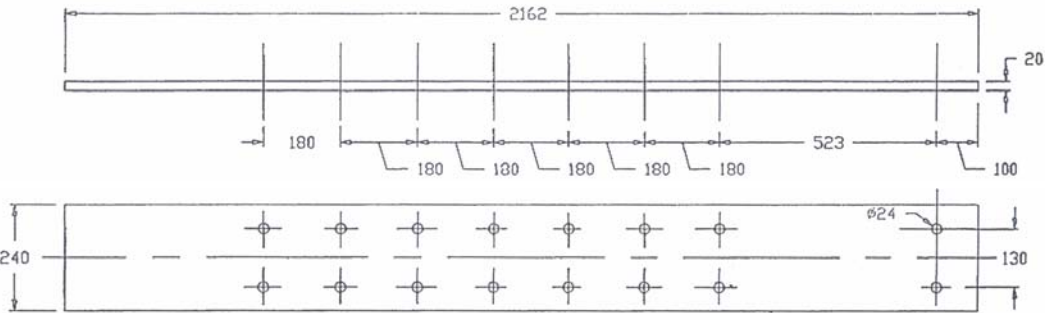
K-bracing and shear-link: detail of Pos. 14
